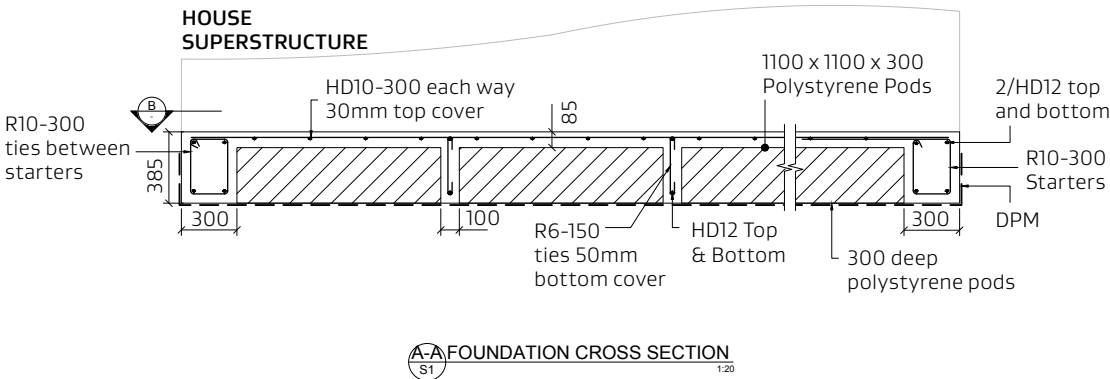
Modified Enhanced Waffle Slab foundation details
